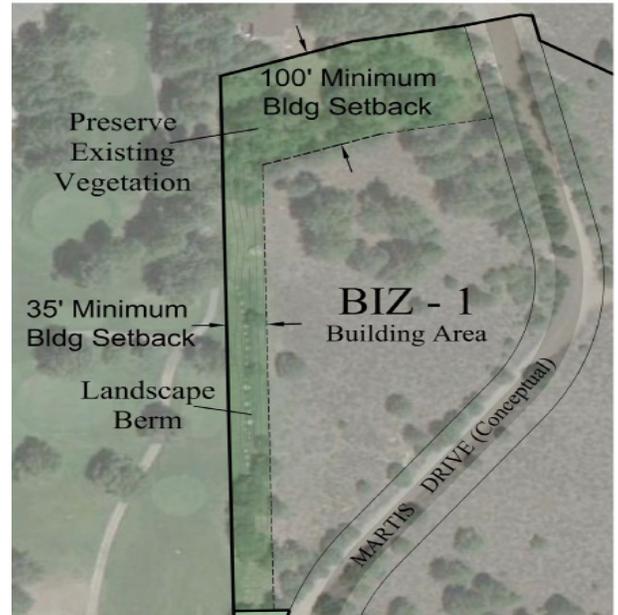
A: BIZ-1 BUILDING AREA
